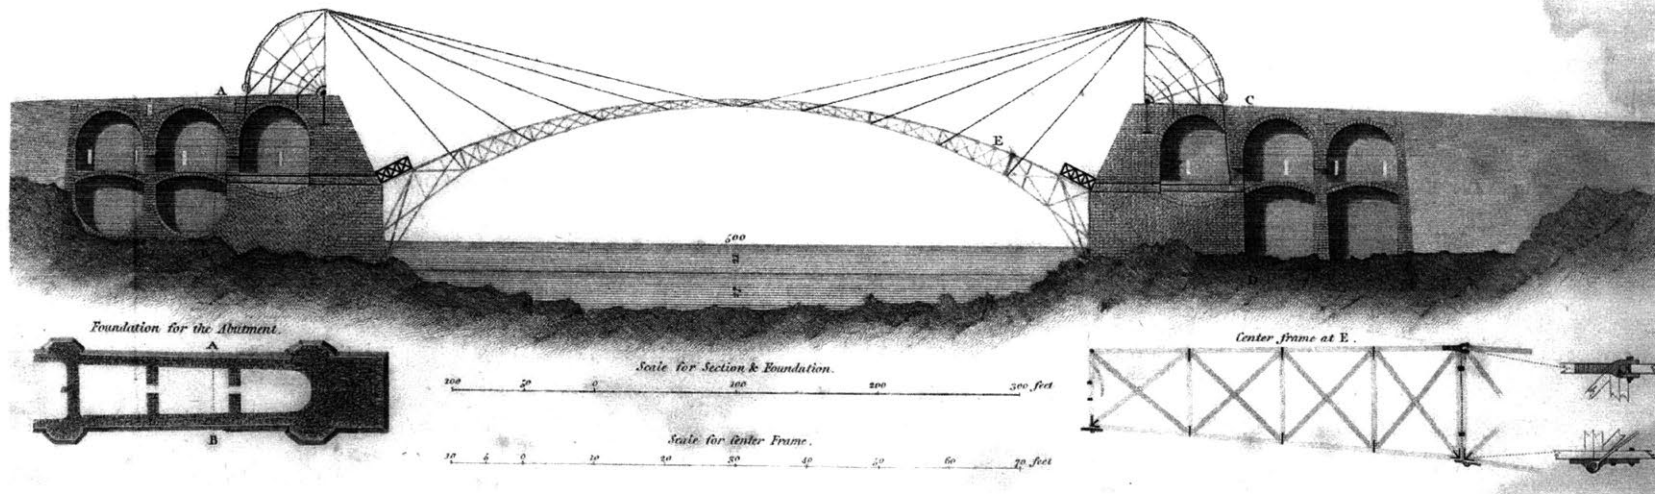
Design for centering for proposed Menai Bridge (*Report from the Committee on Roads to Holyhead 1811*)
